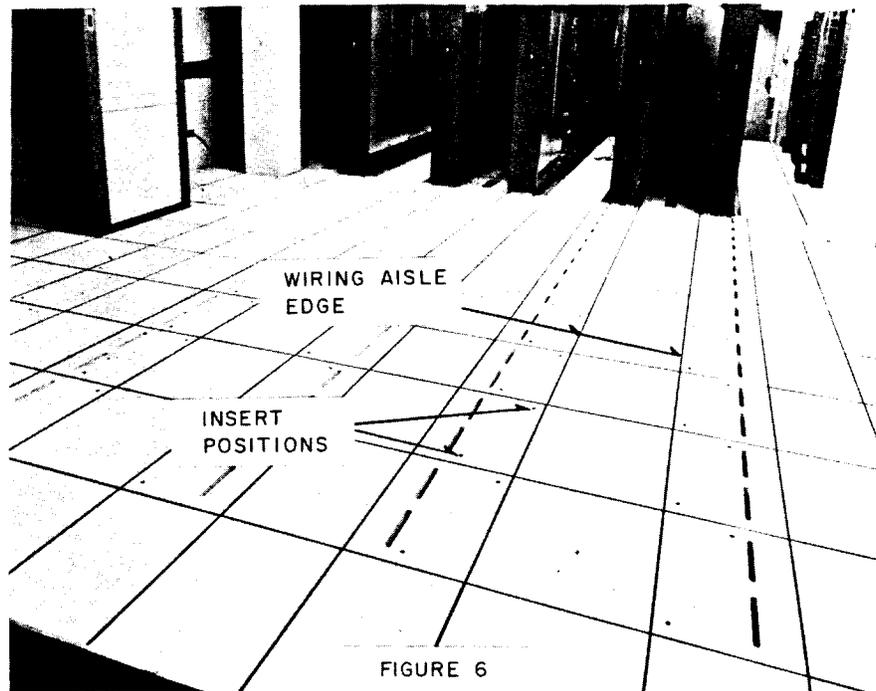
Support Panel Locations for Fixed Floor Plan and Raised Floor System
